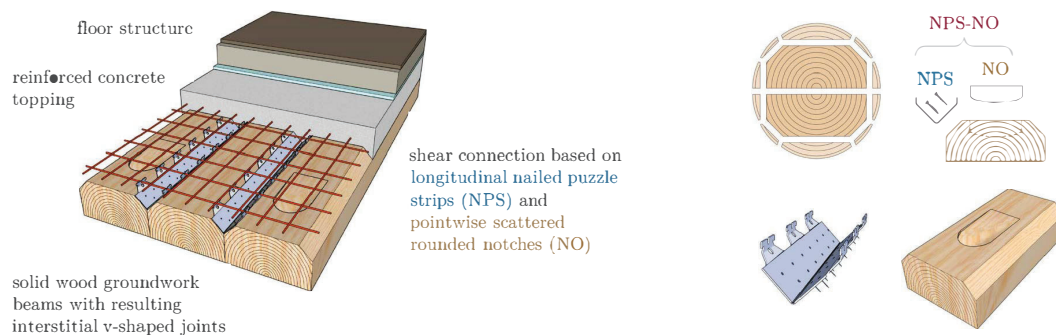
Novel multi-layered solid wood-concrete-composite floor system based on the traditional “Doppelbaumdecke” (dowel beam floor)
